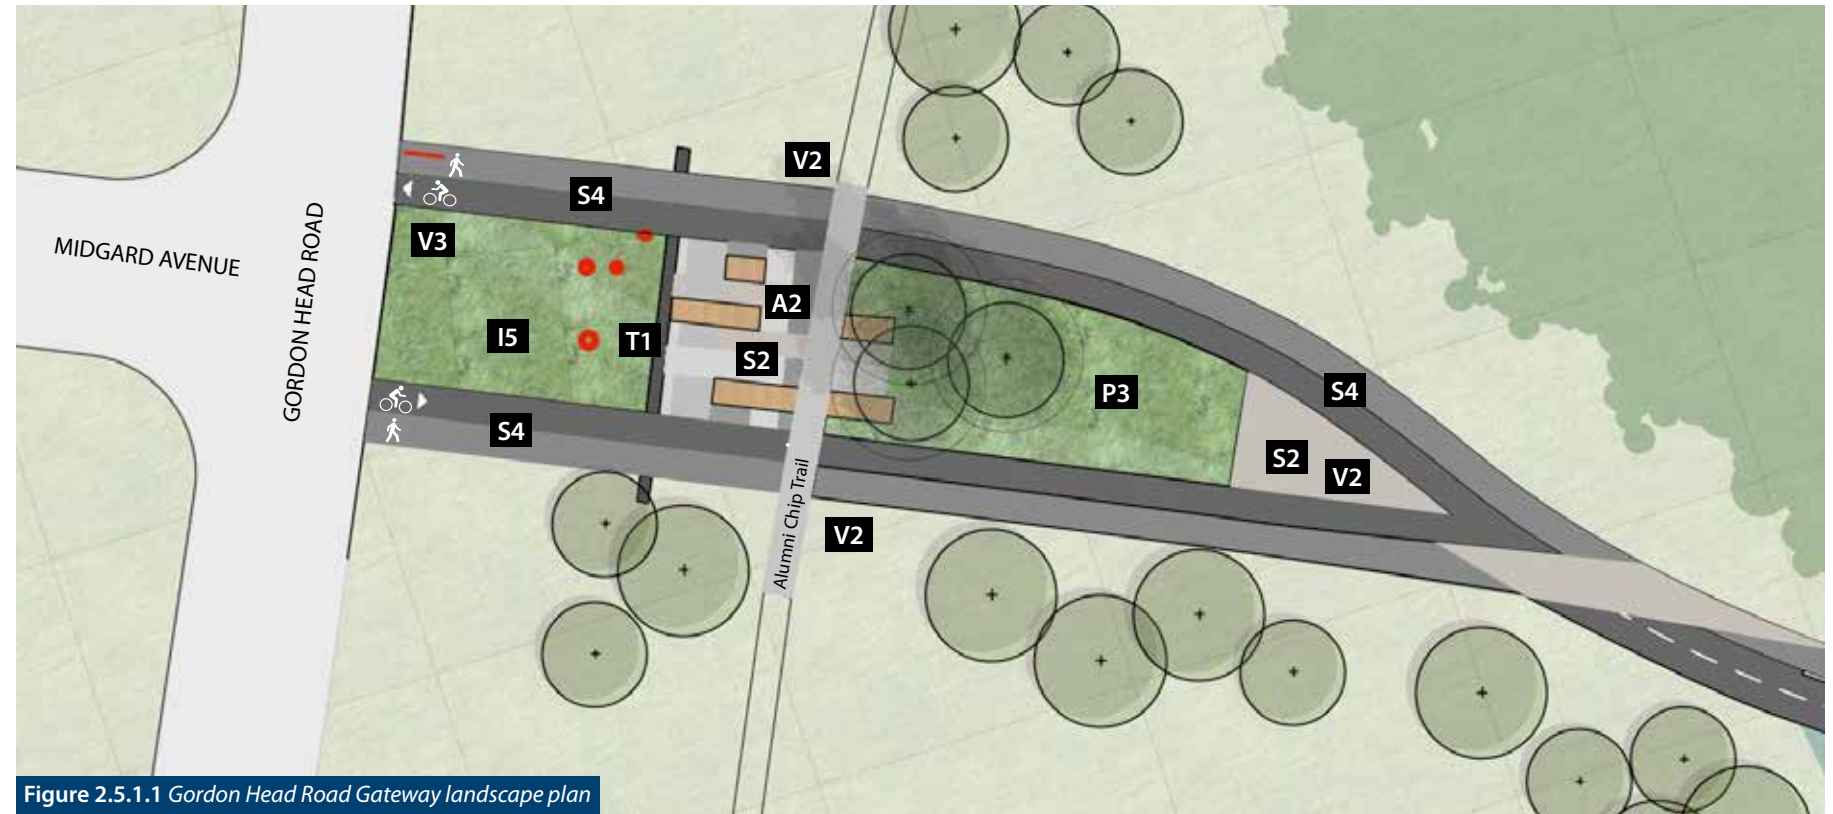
Gordon Head Road Gateway landscape plan
